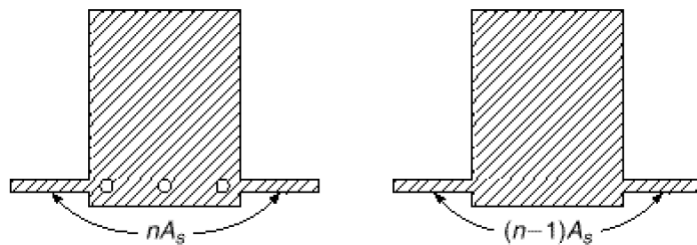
Transformed section for elastic uncracked RC beam.
